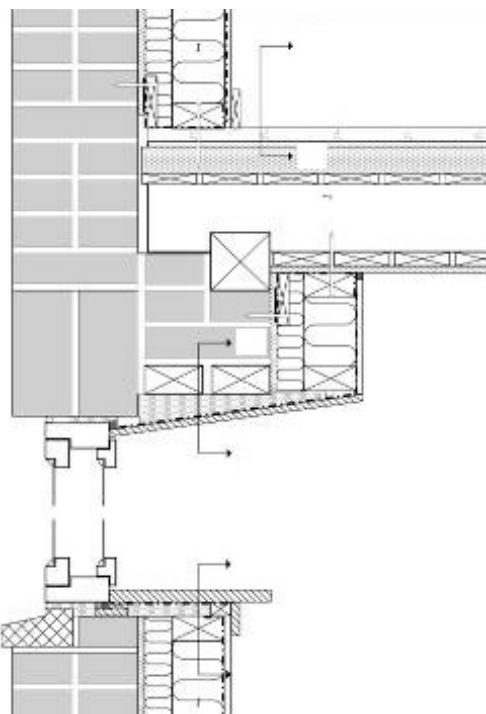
Vertical section of the joint between the loadbearing exterior wall and the horizontal partition at the window wall after improved thermal insulation measures.
